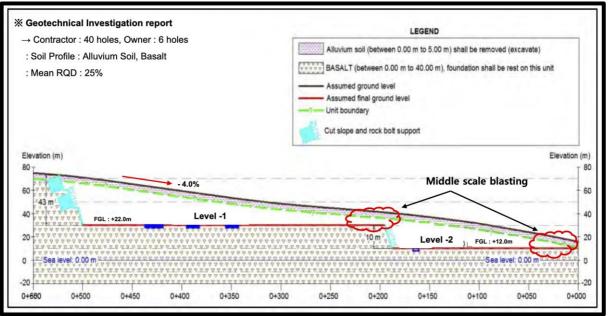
Cross-sectional View of the Project Site after Excavation Works
